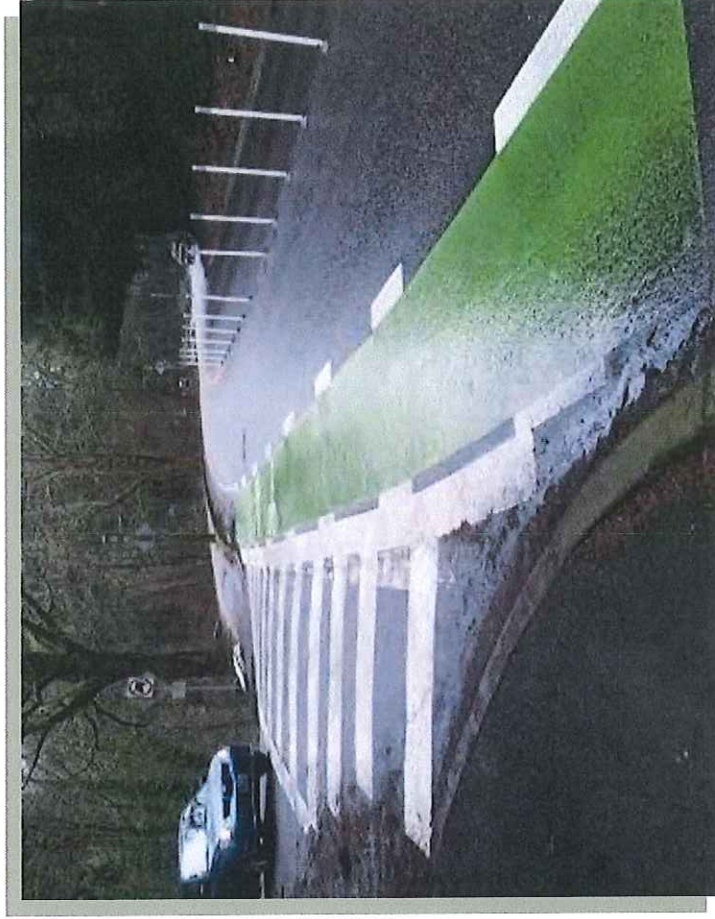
Example of Plastic Bollards along the Street Centerline restricting left-turns
